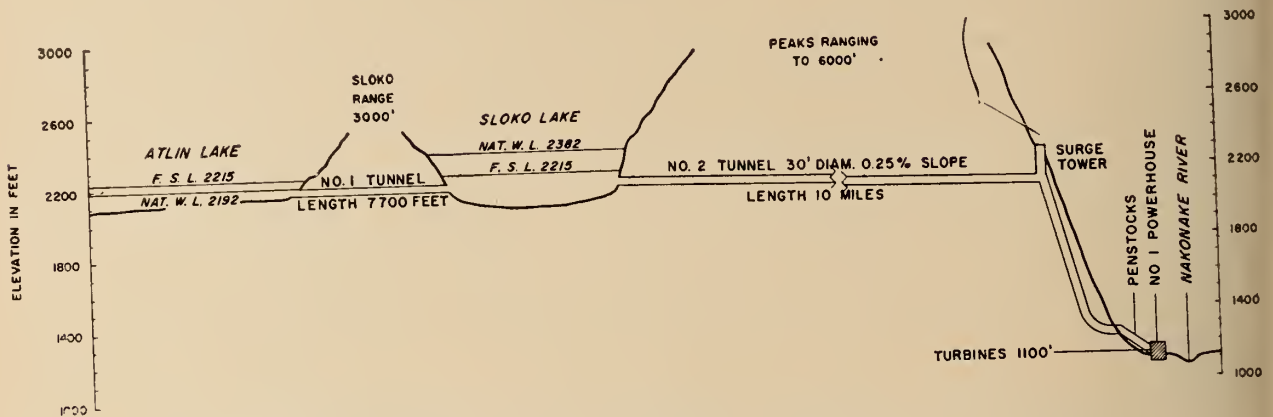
Sketch profiles of tunnels 1 and 2 leading to No. 1 powerhouse on the Nakonake River.
